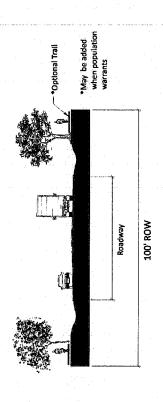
100' ROW Cross-Section for Secondary Roadways
